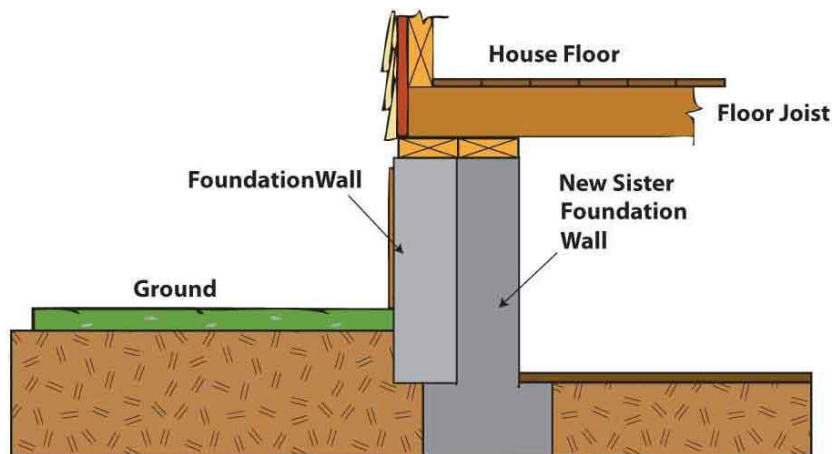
schematic of a typical intervention with a stem wall.
